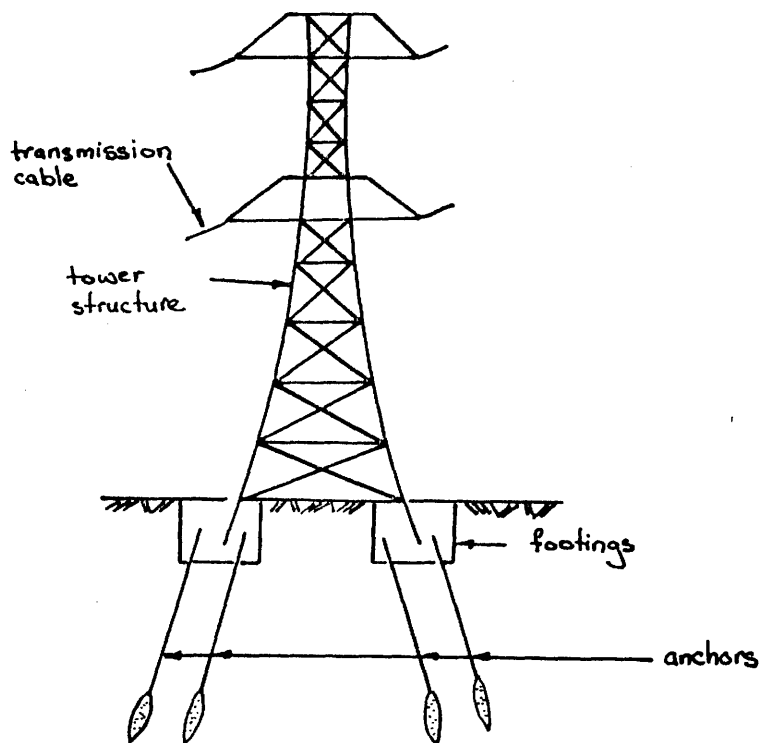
SKETCH OF TOWER SUPPORTED BY ANCHORS.
